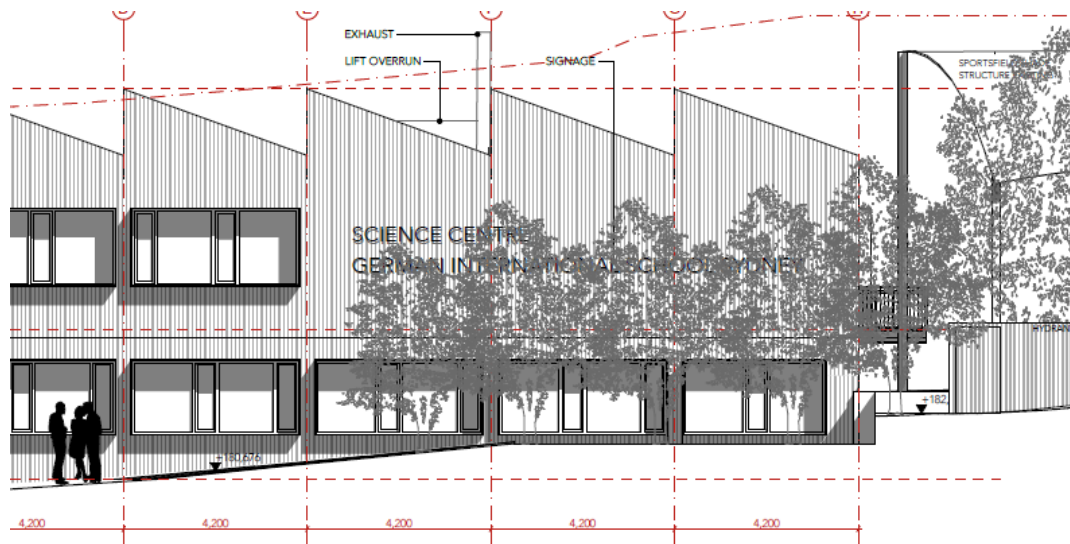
Proposed signage as detailed on the street elevation (Source: Betti&knut architecture)
